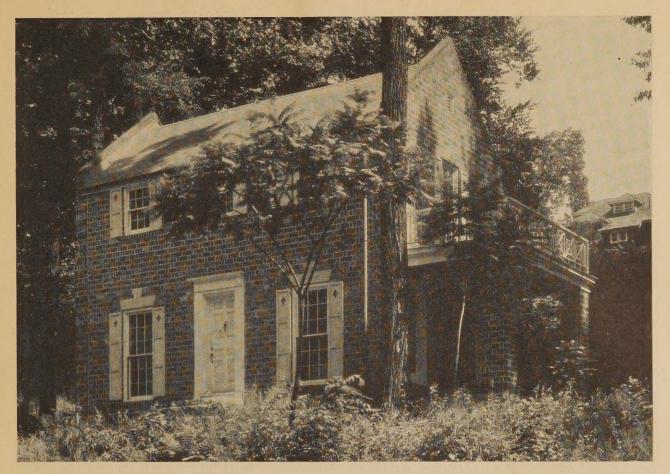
House at Dobbs Ferry, New York. All-rolok wall in Flemish bond.
